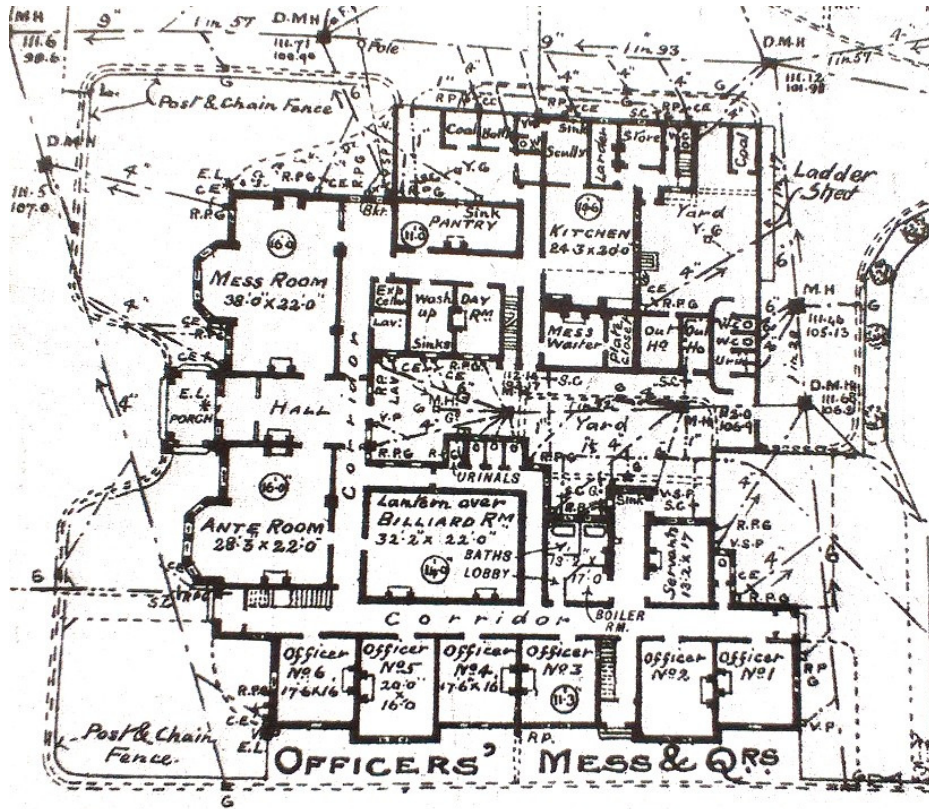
Extract from 1910 plan showing the original function and layout of the ground floor of MEE 17 (EHA 95/1579).
